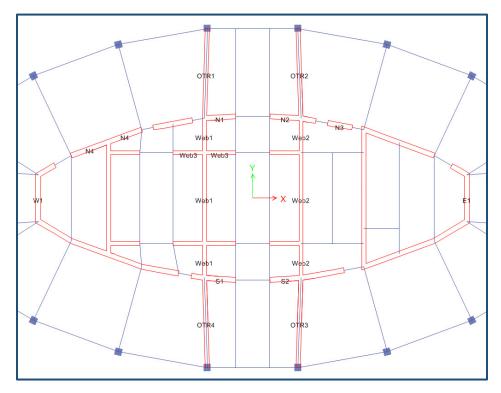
Plan view of Core showing ETABS® Wall Pier and Spandrel Labels
